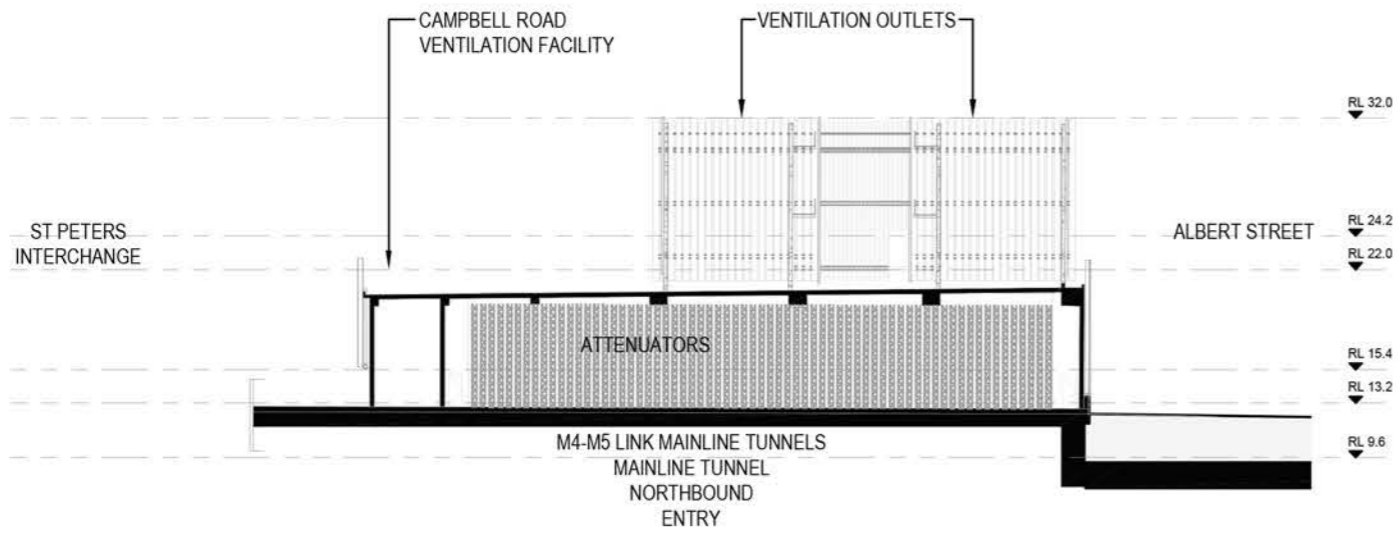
Campbell Road ventilation facility – south and east elevations
